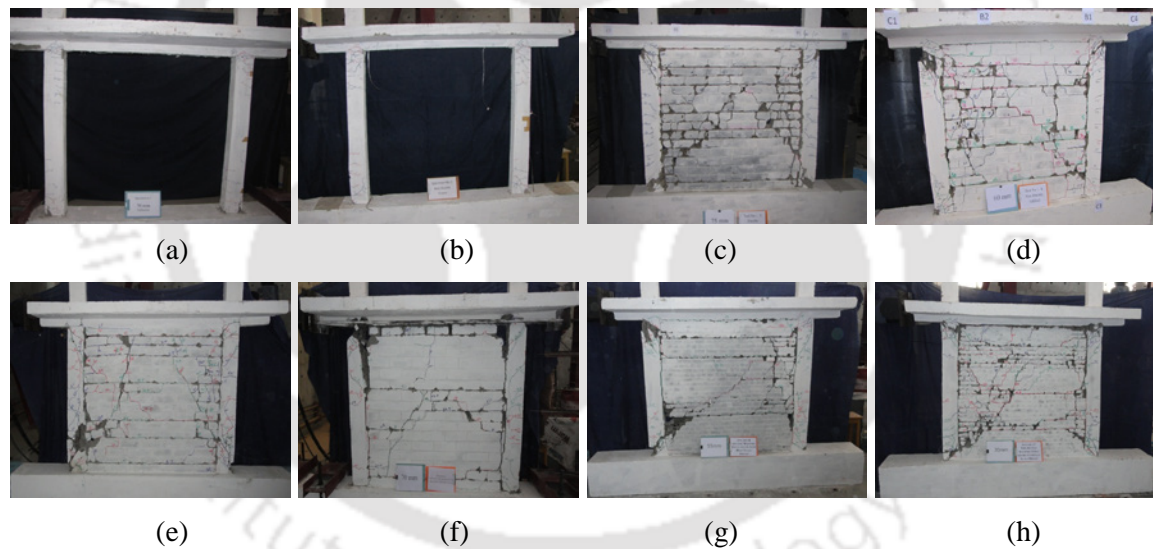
Failure mechanisms observed in specimens 1-8: (a) ductile bare frame; (b) non-ductile bare frame; (c) ductile frame infilled with full-scale bricks; (d) non-ductile frame infilled with full-scale bricks; (e) ductile retrofitted frame infilled with full-scale bricks; (f) non-ductile retrofitted frame infilled with full-scale bricks; (g) ductile frame infilled with half-scale bricks; and (h) non-ductile frame infilled with half-scale bricks.
